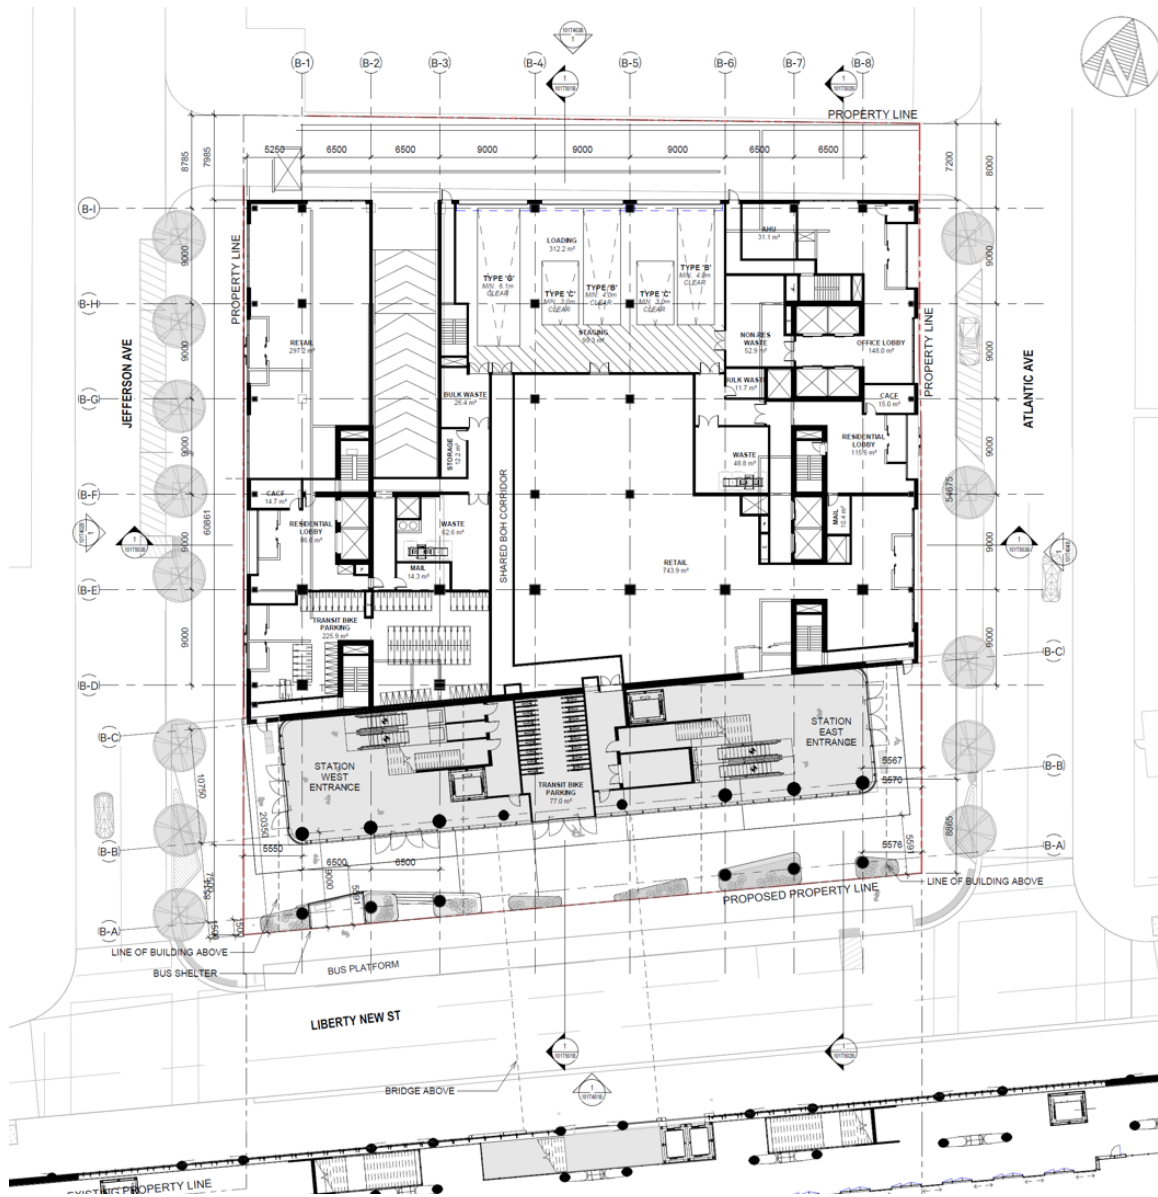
Site B (2-20 Atlantic Avenue, 1 Jefferson Avenue) Site Plan
